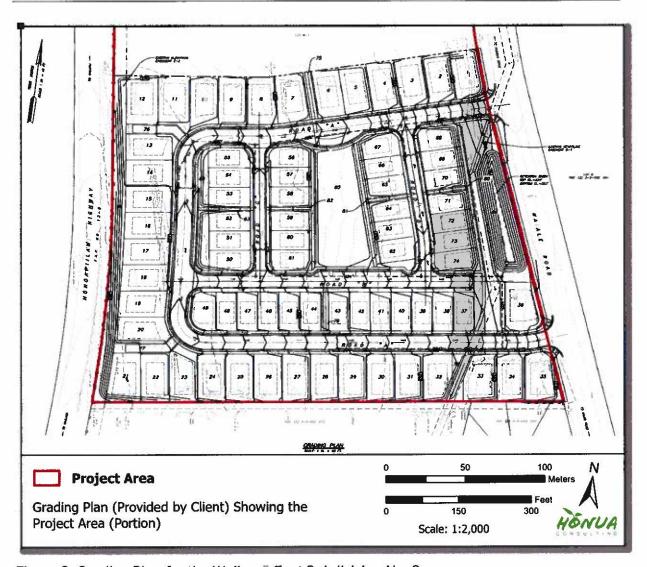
Grading Plan for the Waikapū East Subdivision No. 3
